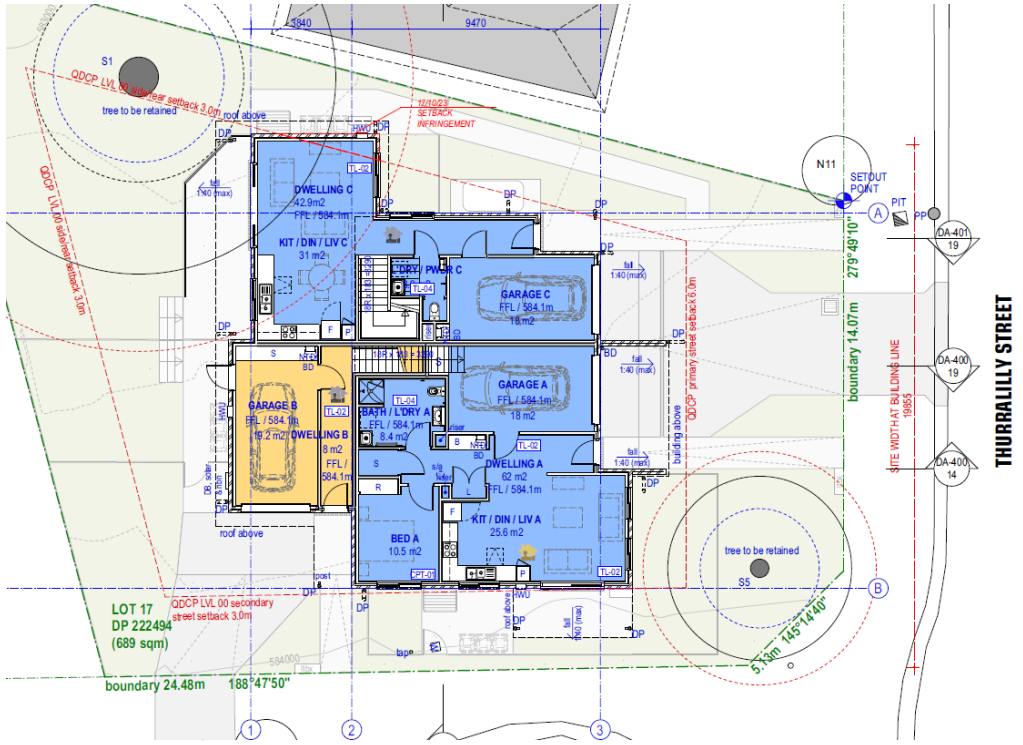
Extract of Ground Floor Plan (Source Kennedy Associates Architects)
